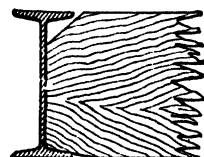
Framing I Beam and Wooden Beam of Same Depth
